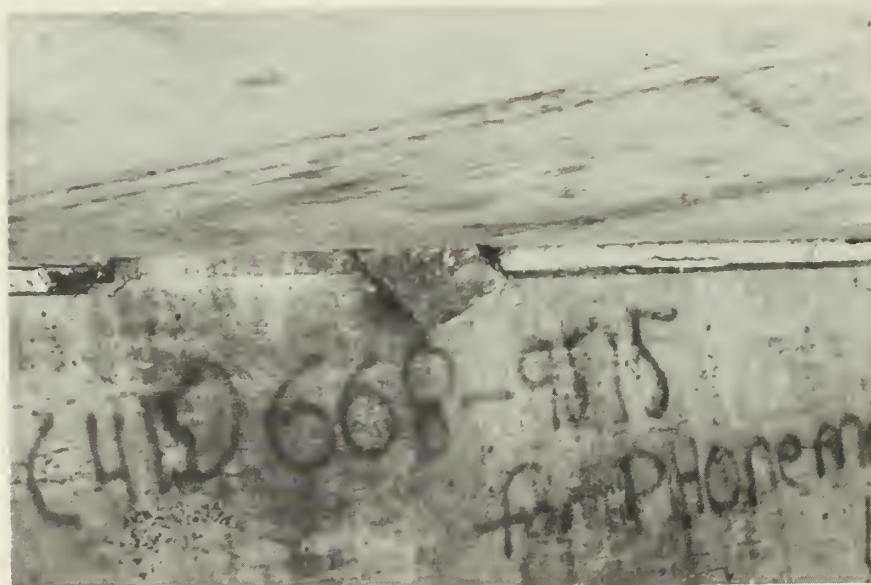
Coyote Creek Bridge, Br. No. 37-349L
